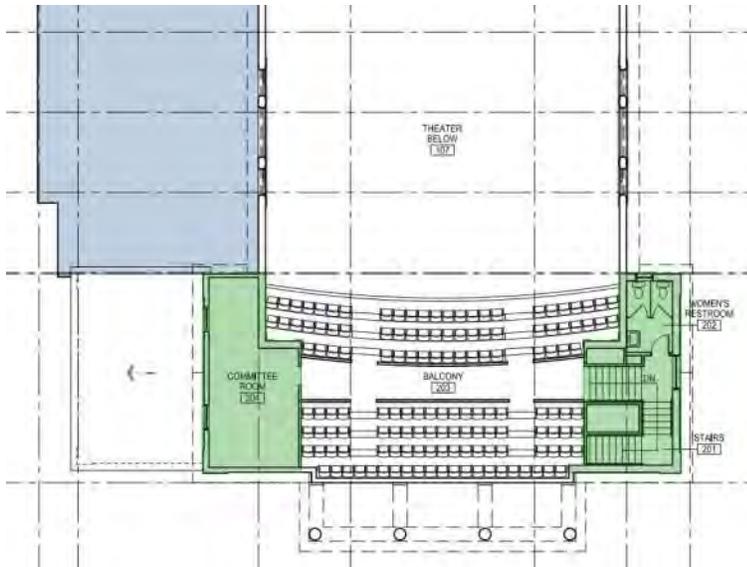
Location of rooms with hairline cracks on the Architectural Resources Group second floor key plan.
